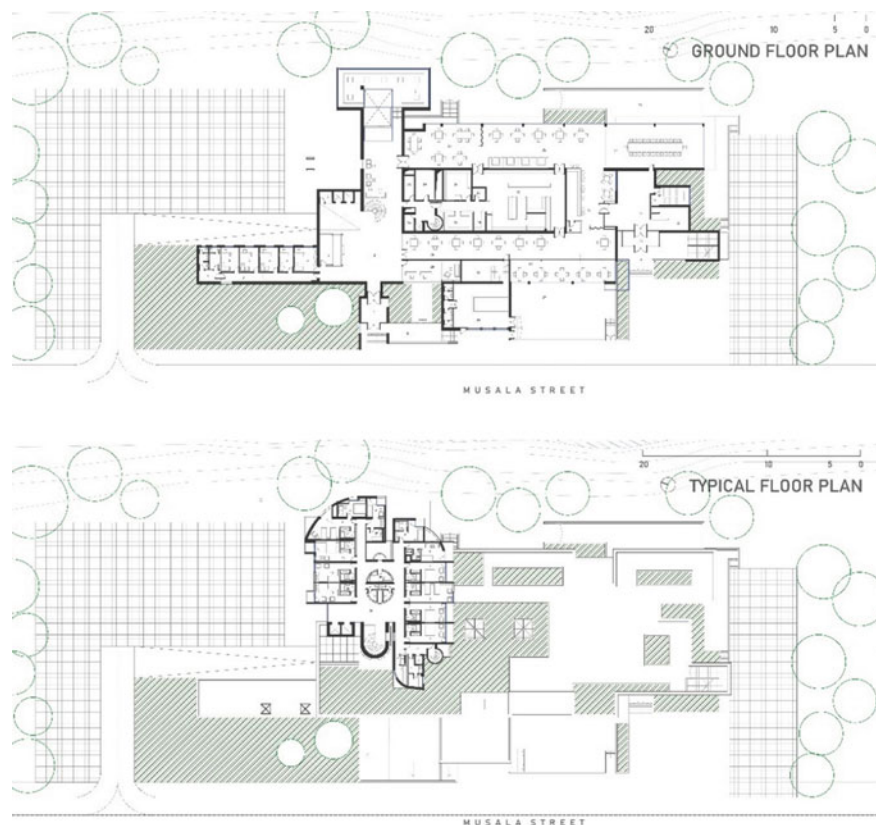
Ground floor and typical floor plan layout of the hotel Visoko. *Source* Illustrated by Zejneb Basarik
